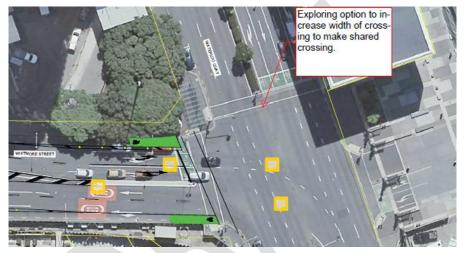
Excerpt from plan - Whitmore Street / Waterloo Quay intersection (C19)
